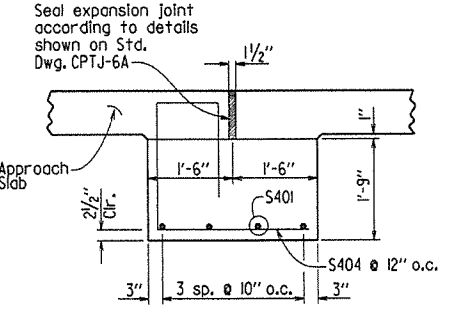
DETAILS OF LONGITUDINAL CONSTRUCTION JOINT
